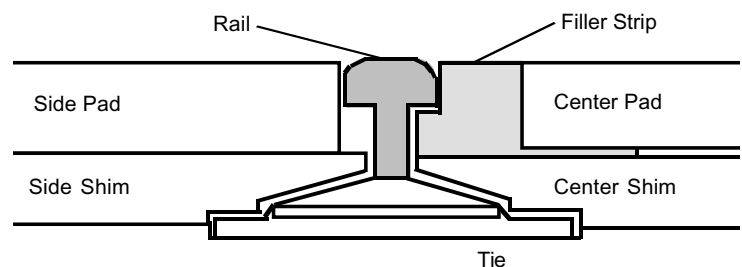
Cross section of rubberized railroad crossing with flangeway filler strip for low-speed angle crossings. Source: NCDOT
